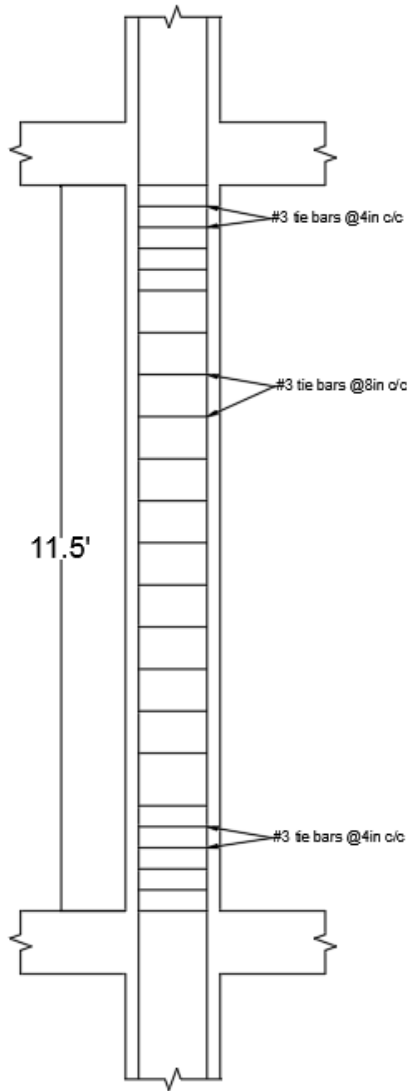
Column rod detailing of CC, CEX and CI for all floors
